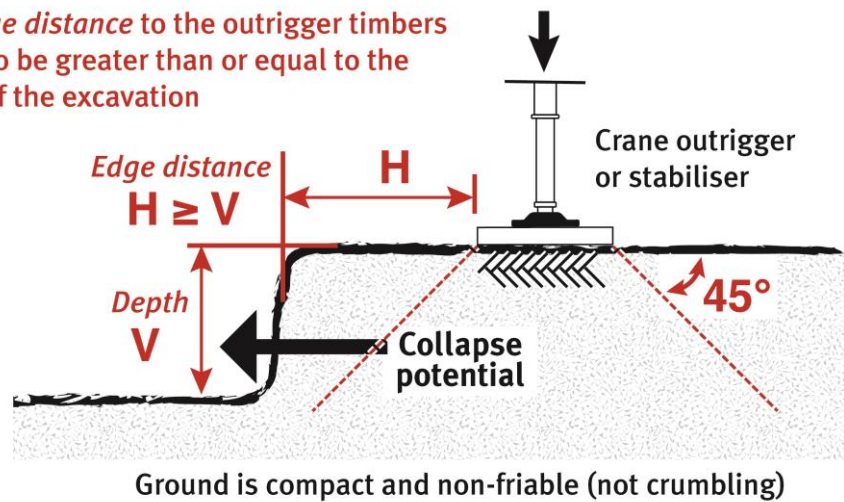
A three-metre deep excavation in compact ground, the outrigger timbers or pads should be a horizontal distance of at least three metres away from the closest edge of the trench wall.
